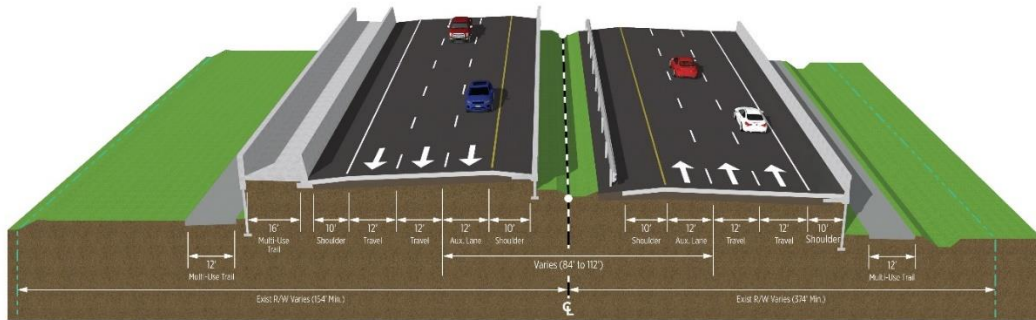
Segment 3 – Typical Section 5 from east end of Gandy bridges to approximately 1,800 feet west of Bridge Street
